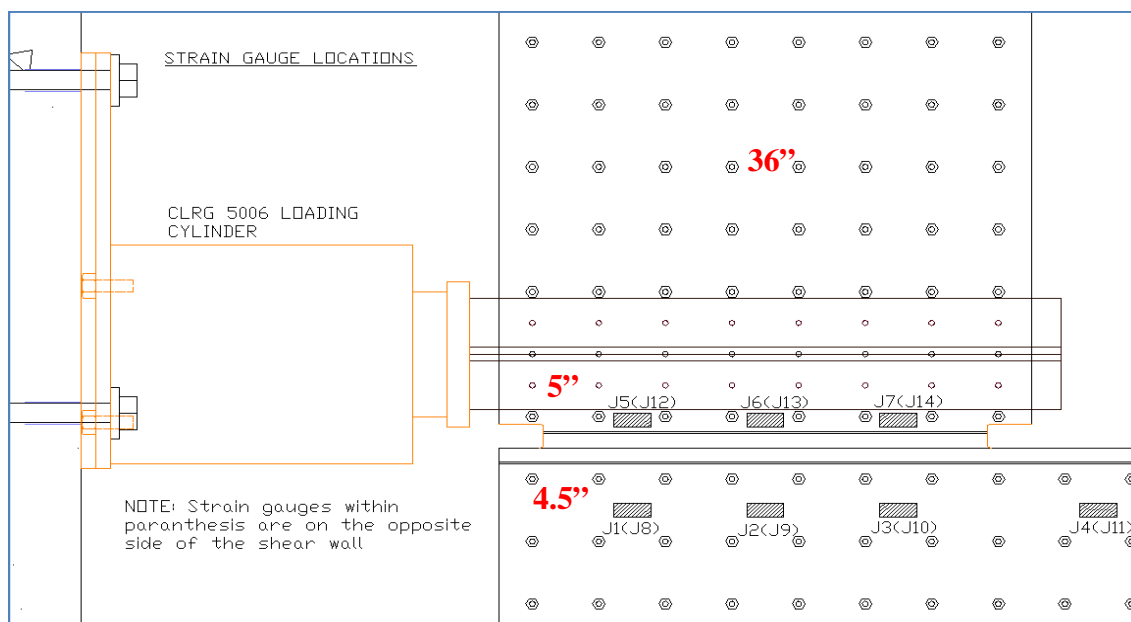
Strain gauge locations for Horizontal Connection Test - Side View
